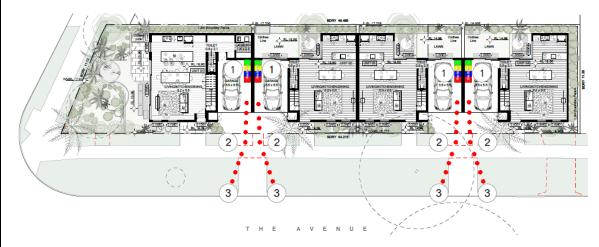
The amended waste management plan, demonstrating the garage accommodates for one car space and bin storage area.
